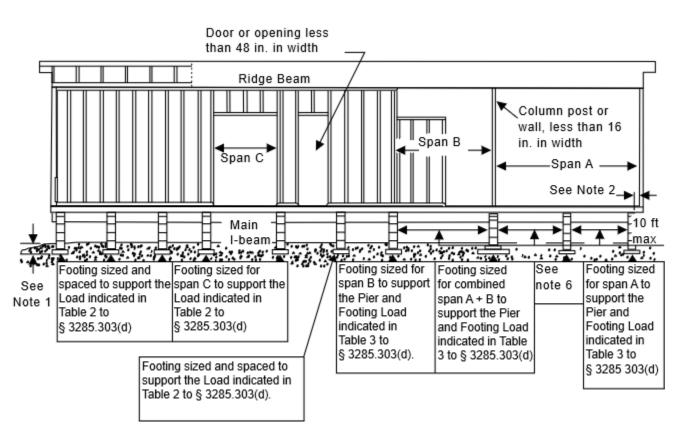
(b) Typical Mate-Line Column Pier and Mating Wall Support when Perimeter Blocking is Required
